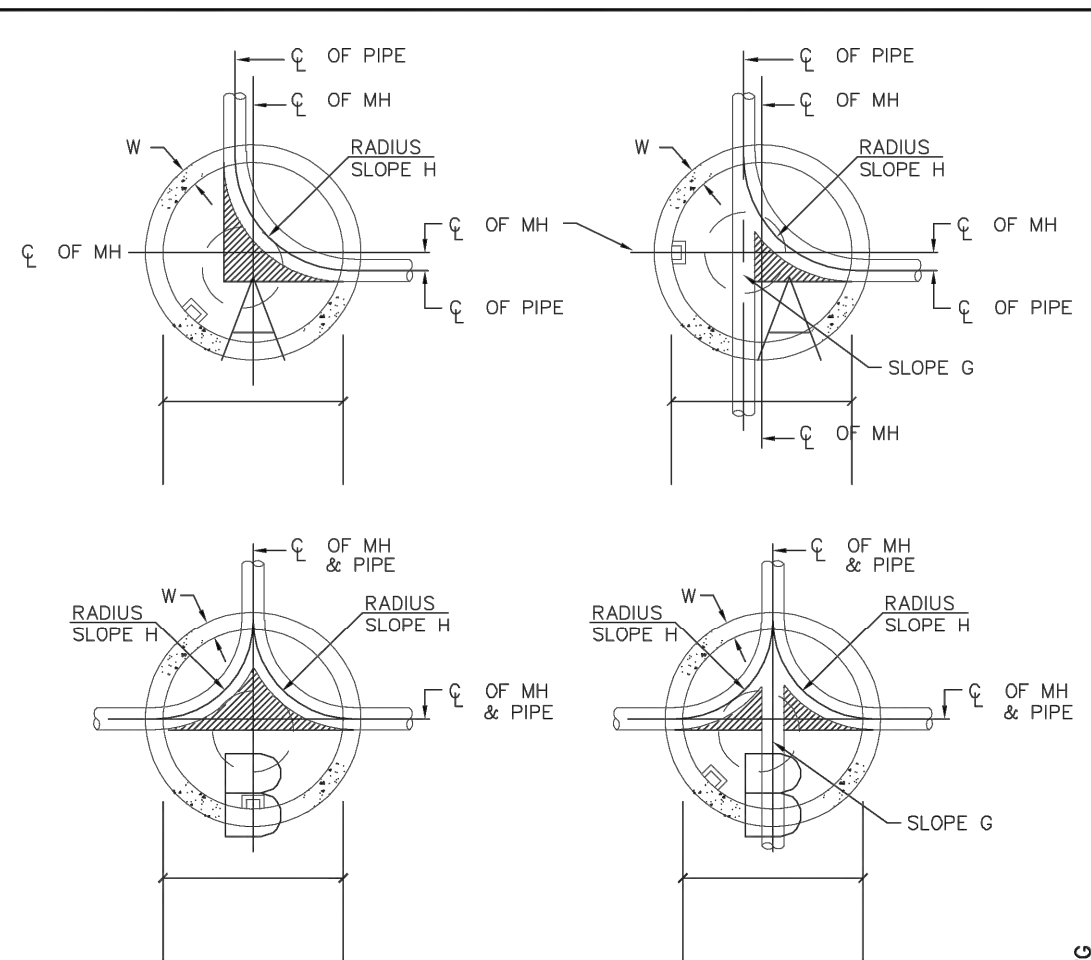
STANDARD MANHOLE DIMENSIONS
